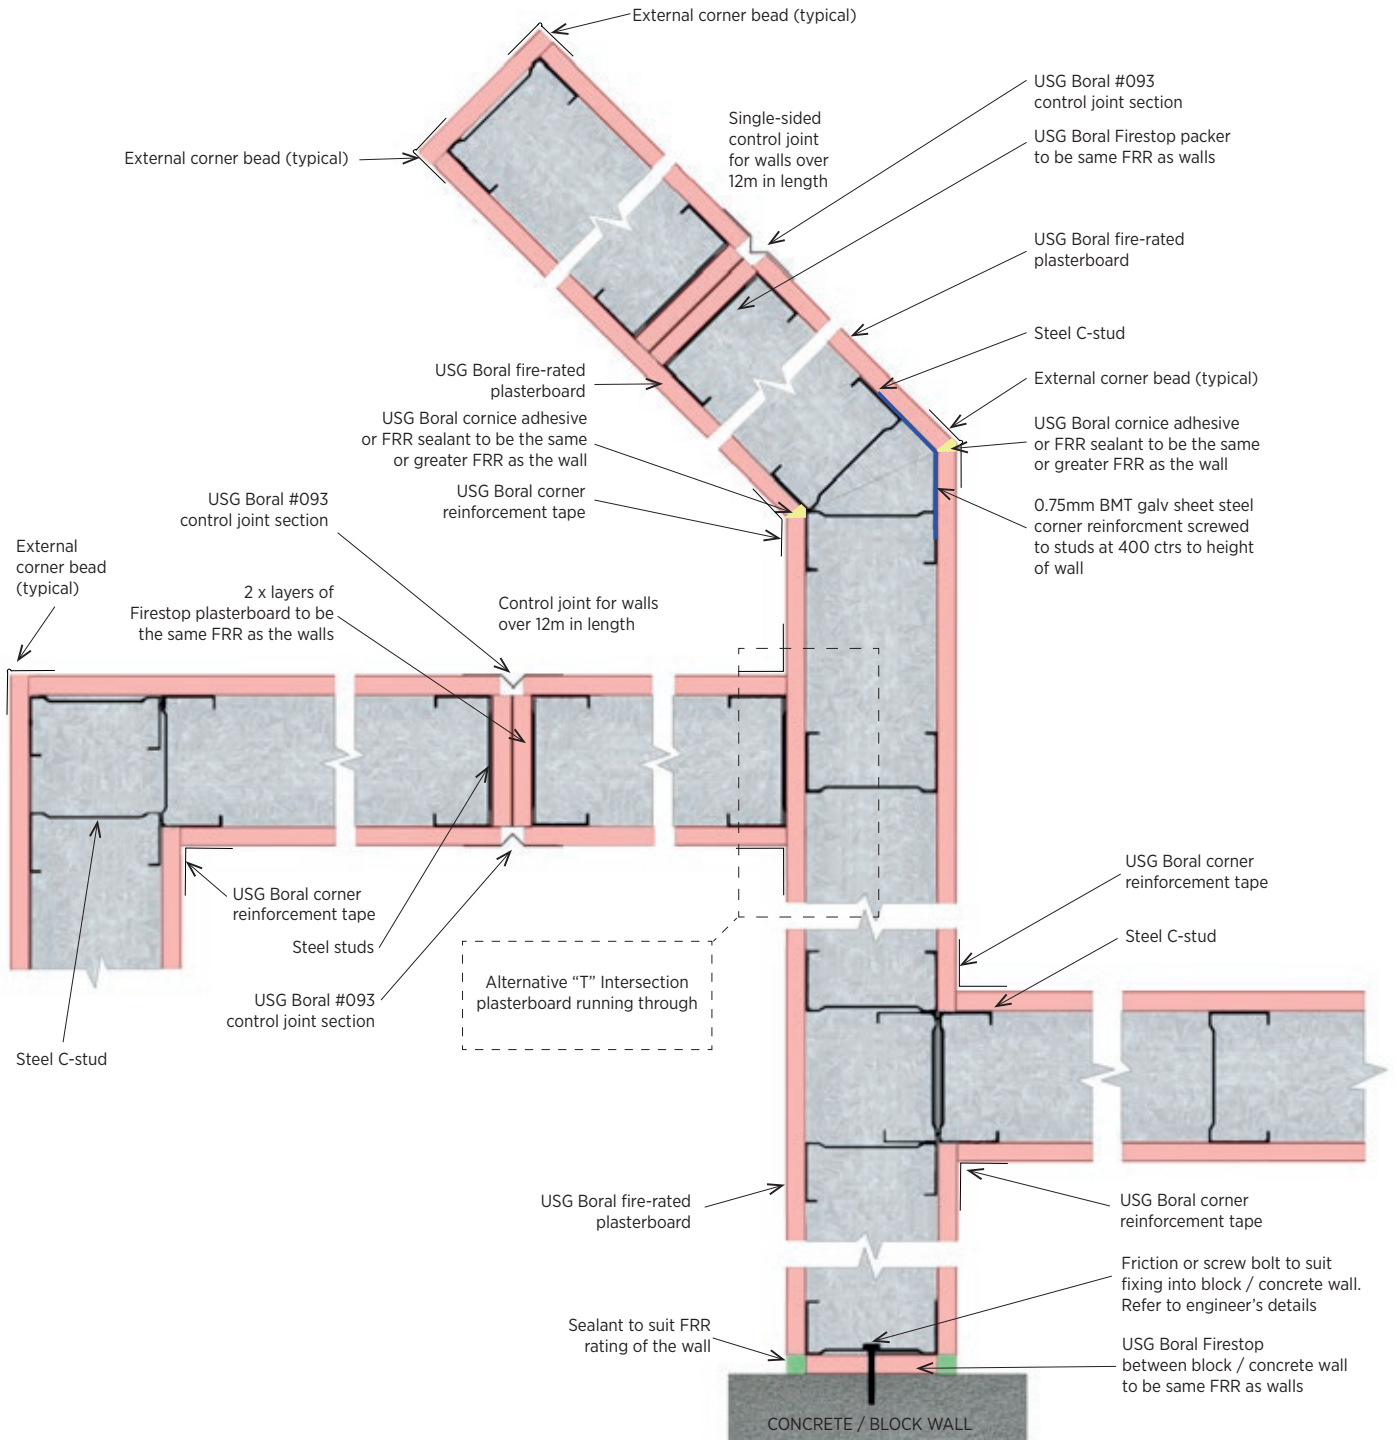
Single Stud Terminal Control Joint and Junction Details 1x Layer Fire-rated Plasterboard (Twin Stud, Staggered Stud layout similar)
